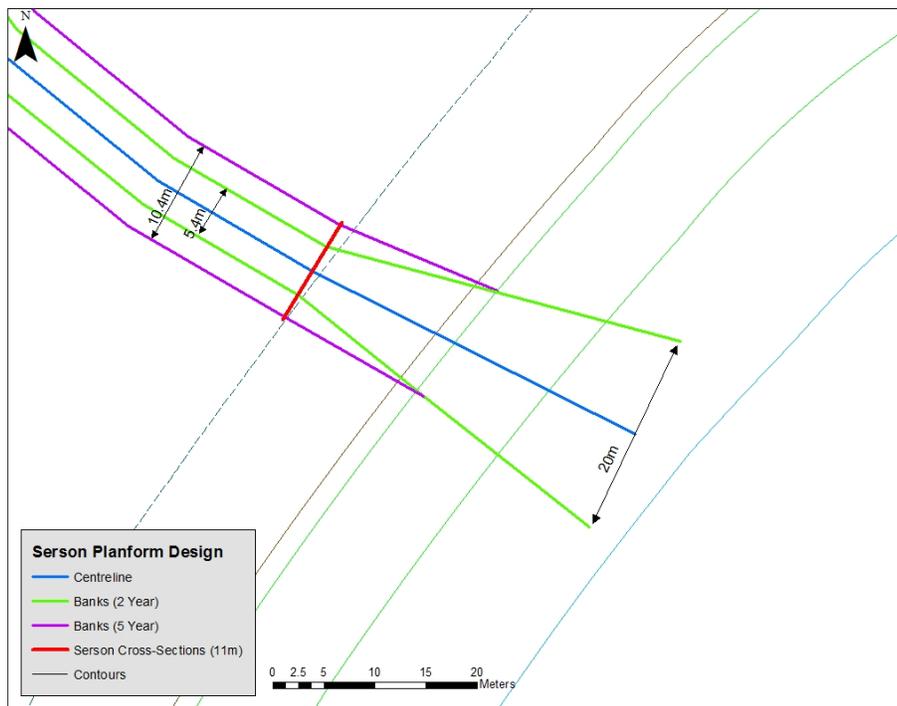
Proposed Serson Creek Planform – Fan Section with Top of Bank Widths
